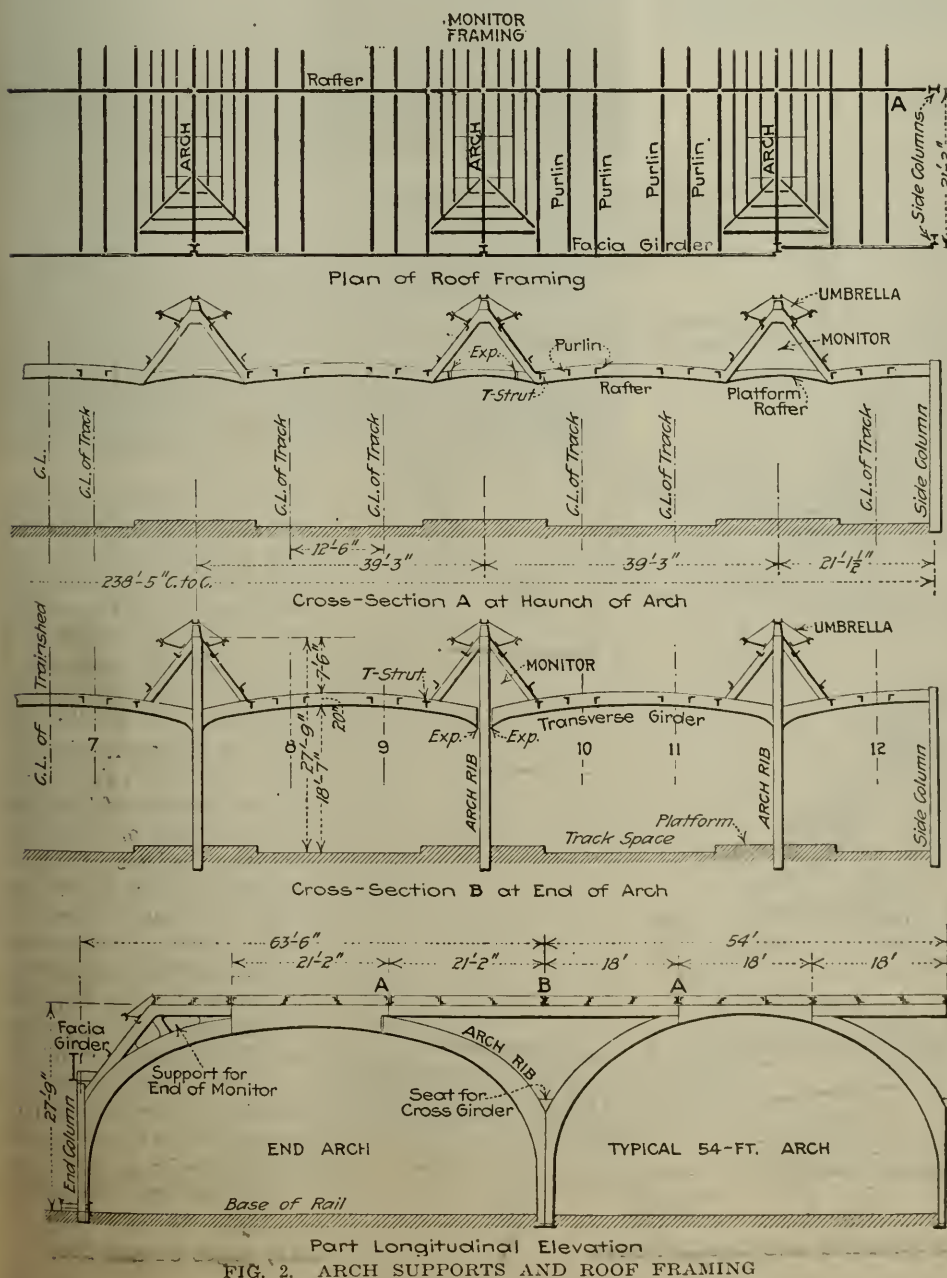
ARCH SUPPORTS AND ROOF FRAMING
